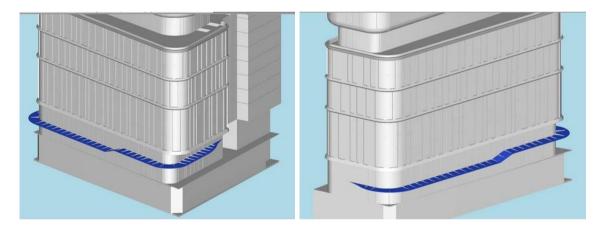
Proposed awnings along Pitt Street for Configuration B tower envelope viewed from the north-east (L) and south-east (R).
